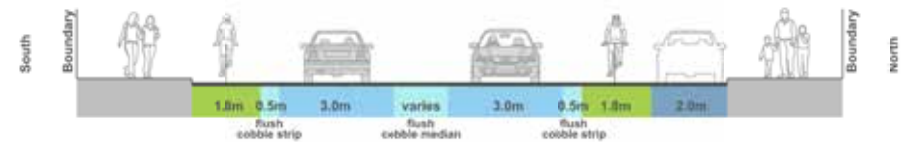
Indicative road cross-section through Woolston. On-street parking provision is proposed to alternate sides of the road based on adjacent land uses. See Figure 56 for an example.
